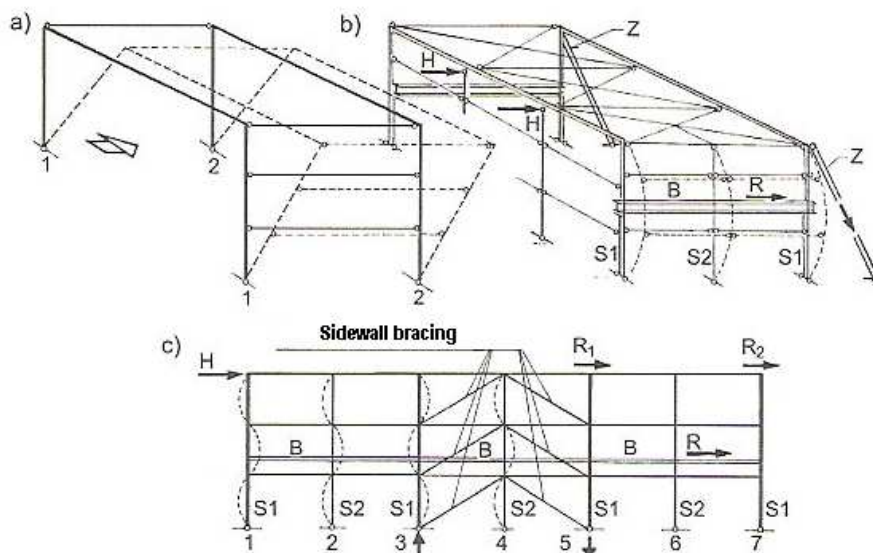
Possible sidewall deformations and the required effect of bracings: S1- main column, S2- secondary column, B- runway beam
